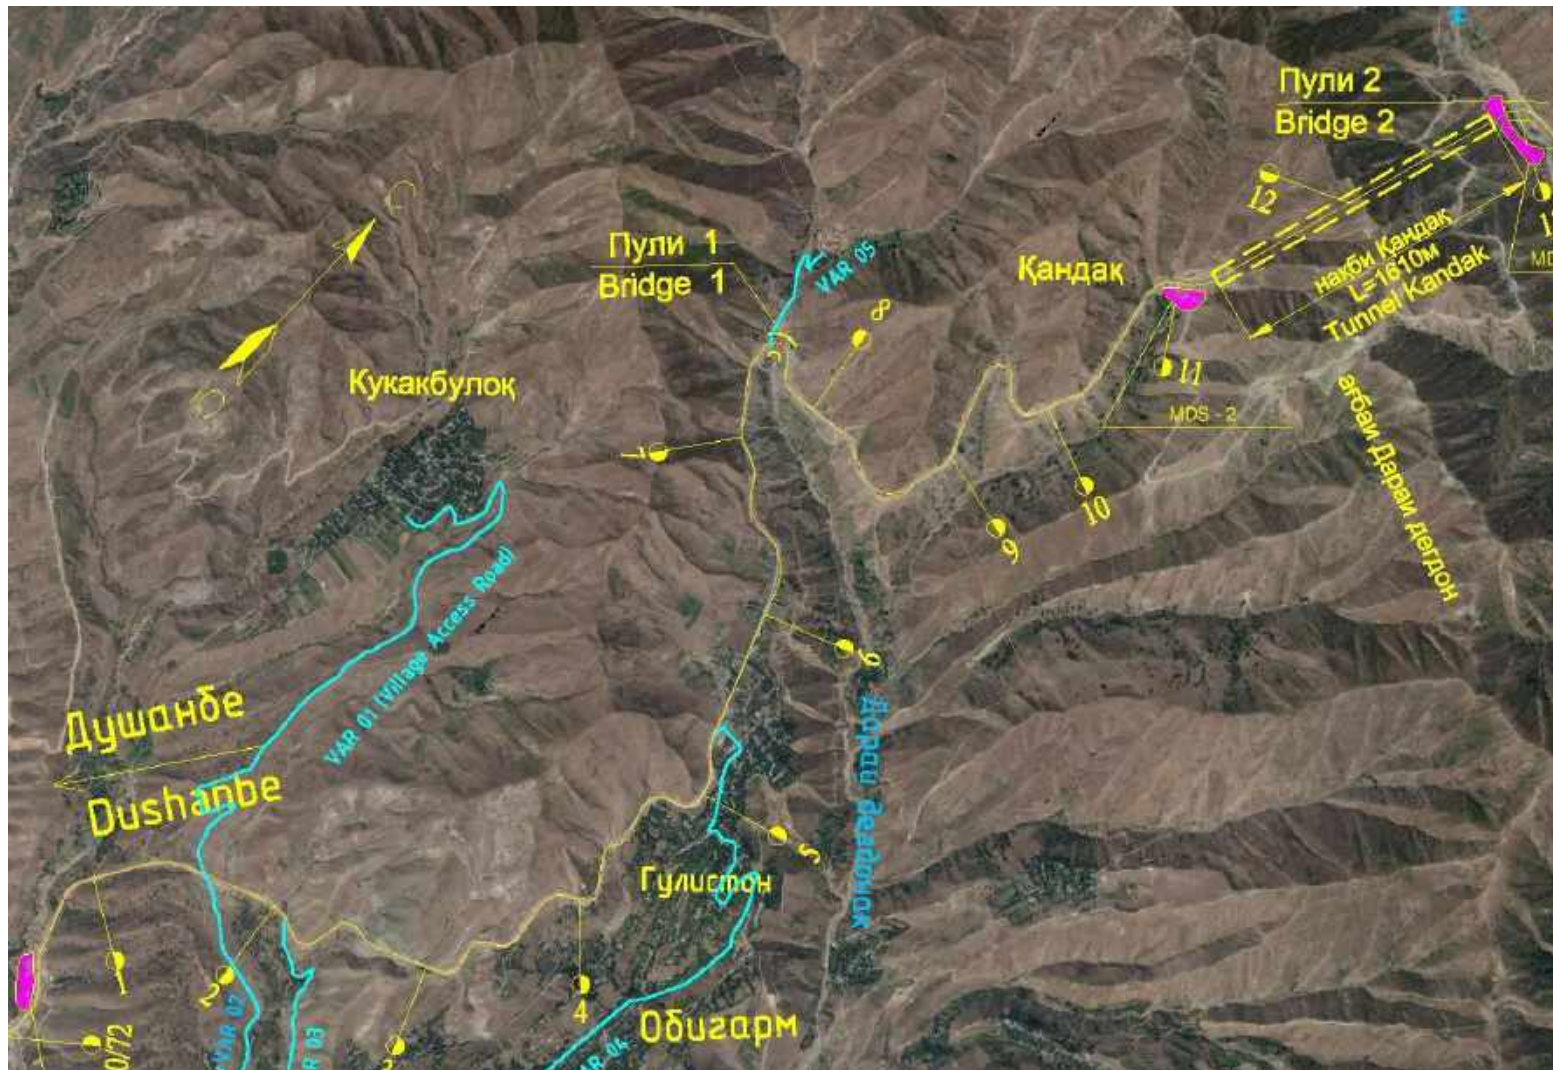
Spoil Disposal Sites (MD1 to 3) start to Tunnel 1
